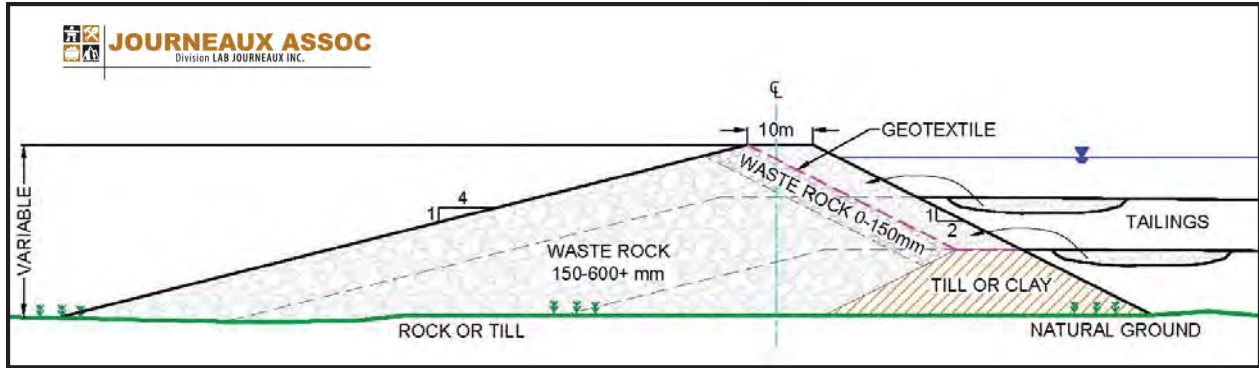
Typical section of a tailings dyke constructed over a water stream (downstream construction method)
